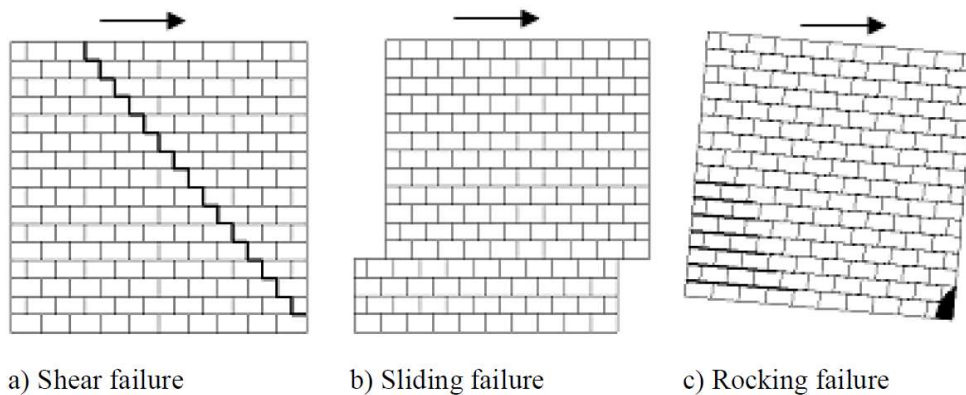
In plane failure mechanisms of unreinforced masonry walls (Farshchi, Motavalli, Schumacher, & Marefat, 2009)
